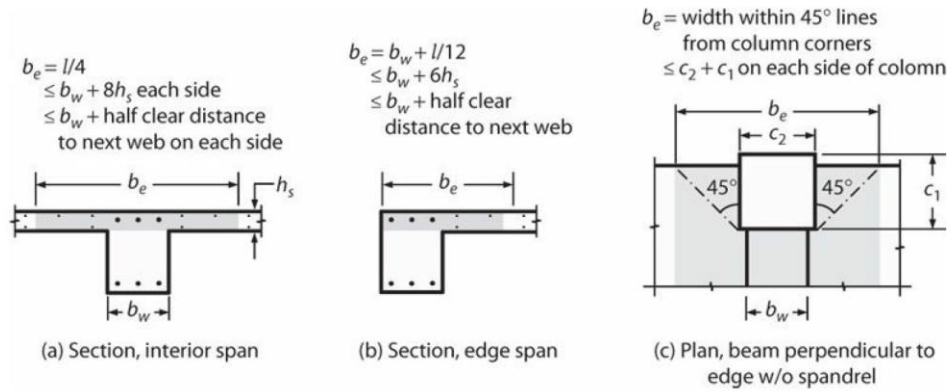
Definition of effective flange width. (a) ACI 318 effective flange width for interior beams with slab on both sides. (b) ACI 318 effective flange width for edge span beams with slab on one side. (c) ACI 352 effective flange width for beams framing perpendicular to a slab edge without spandrel. Where a substantial spandrel is present, the effective flange width of (a) or (b) can be used.
